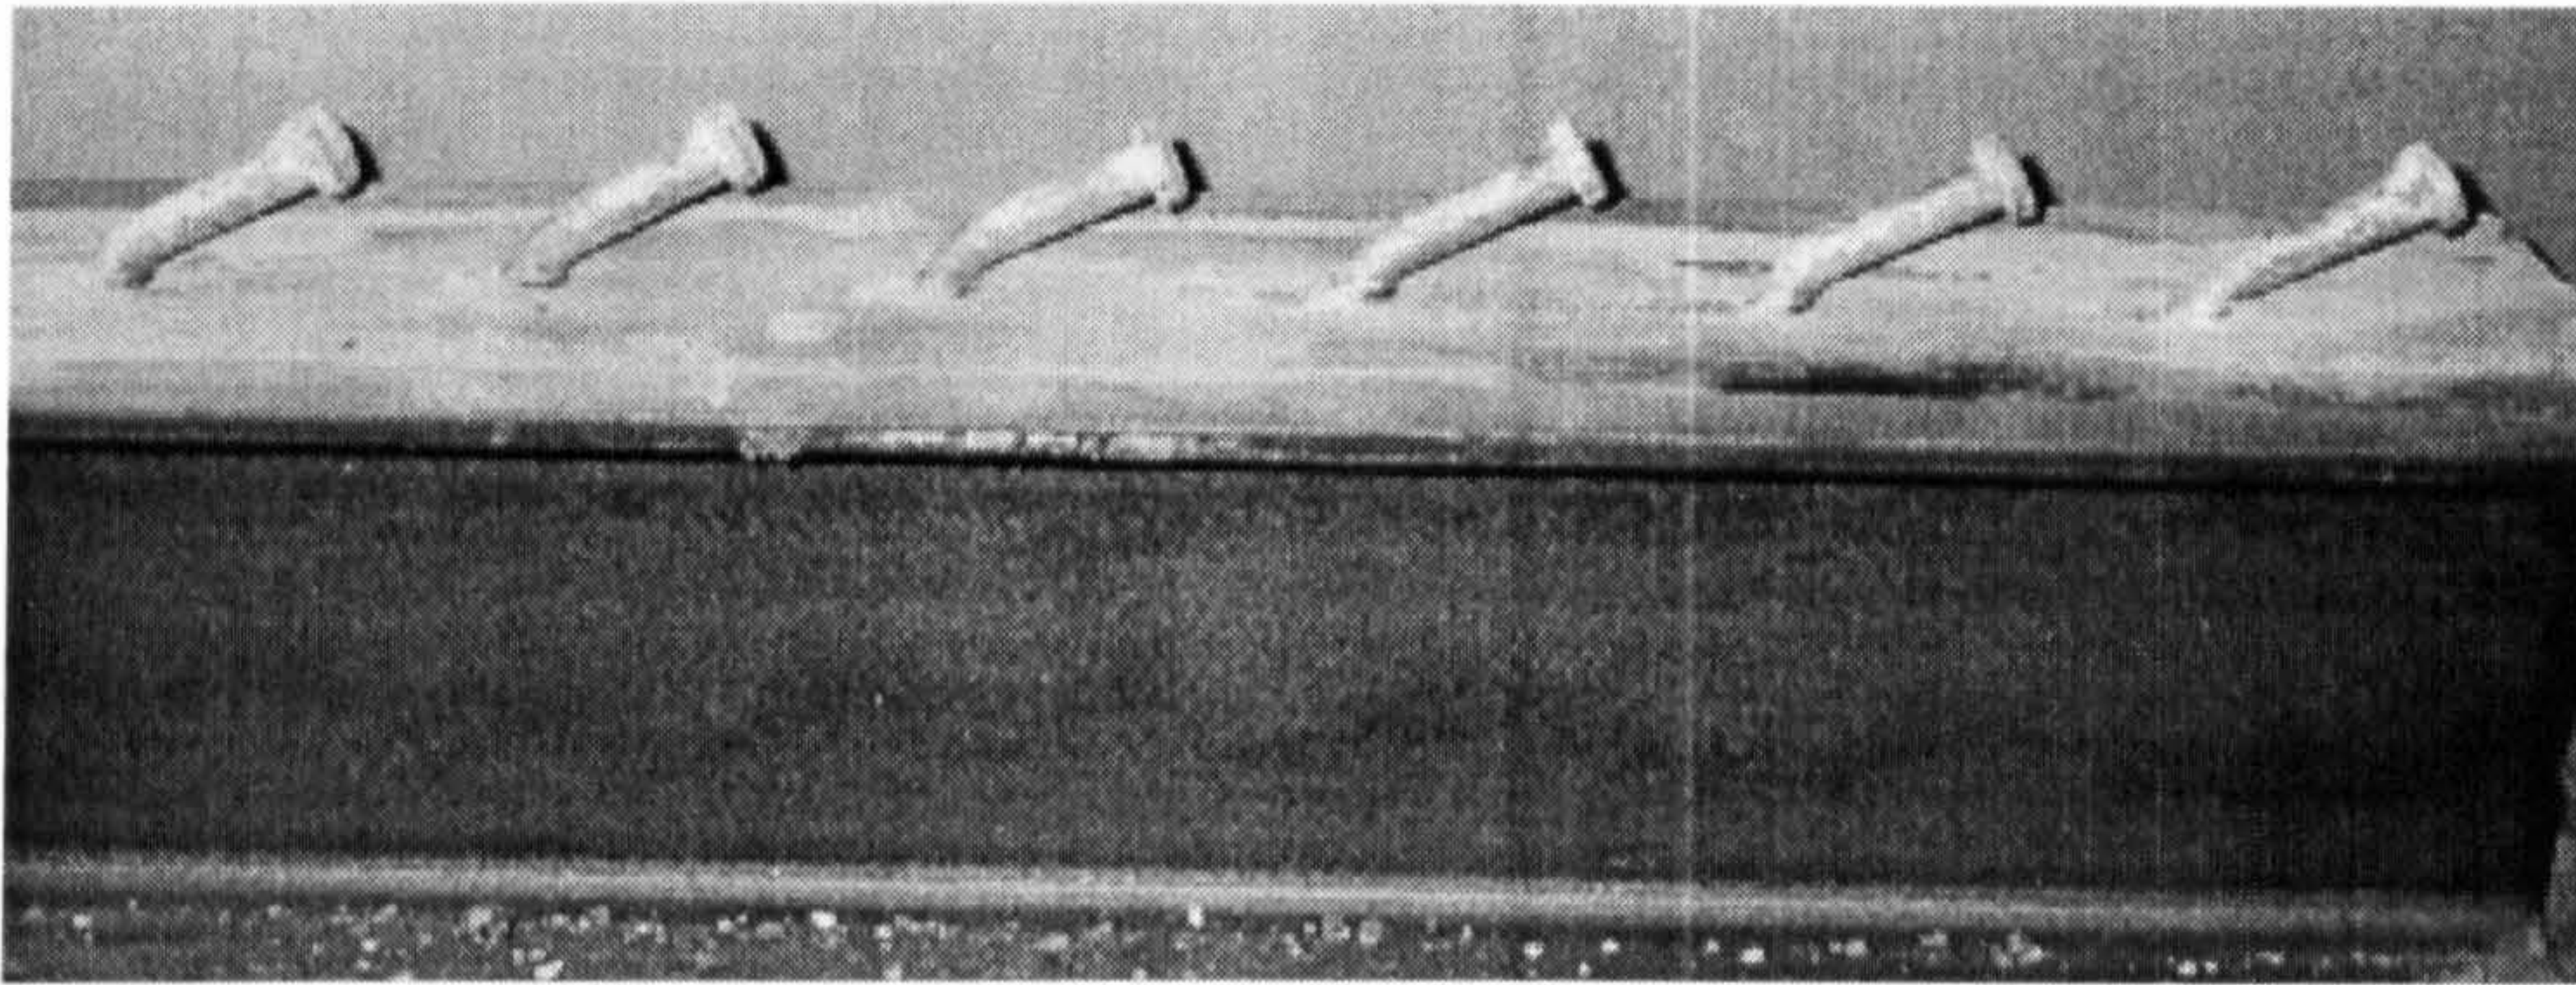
Shear studs for test specimen T 10-C25-150-65 after testing
